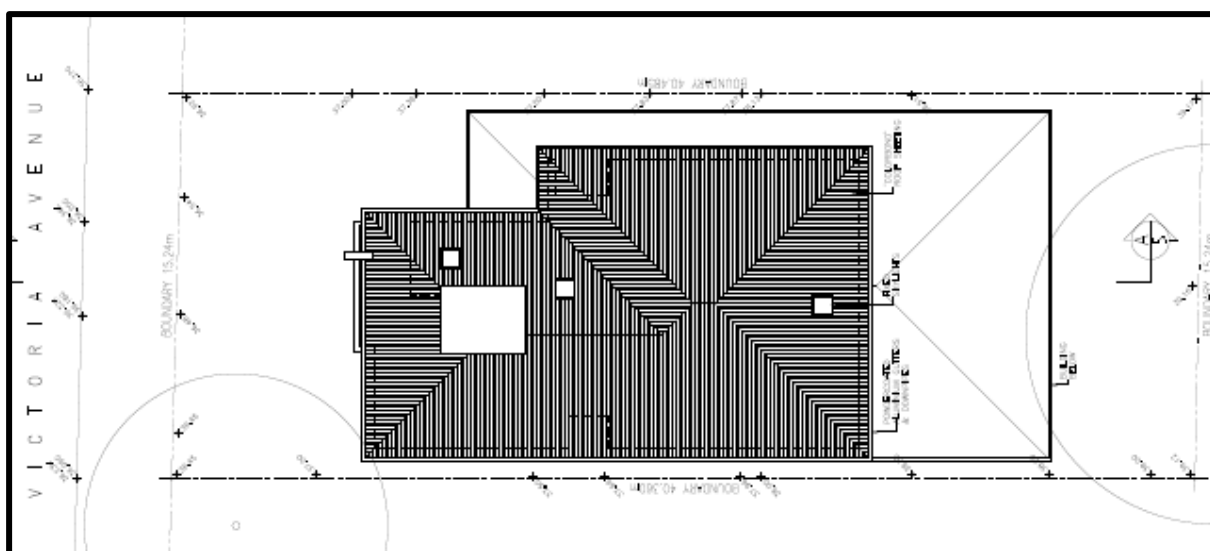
Proposed site plan - 111 Victoria Avenue Mortdale (Source: Cornerstone Design 2019)
